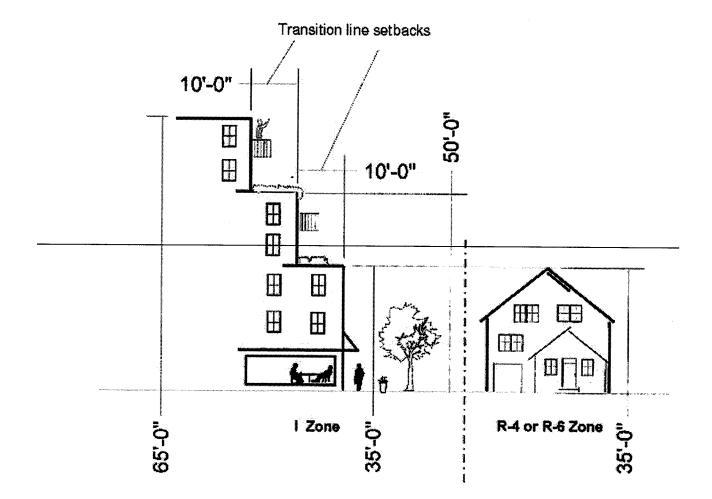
Figure Exception 20.50.020(2): For all portions of a building in the I zone abutting to R-4 and R-6 zones, the maximum height allowed at the yard setback line shall be 35 feet, 50-foot height allowed with additional upper floor setback (transition line setback) of 10 feet. Sixty-five feet allowed with additional upper floor setback (transition line setback) of 10 feet after 50-foot height limit. Unenclosed balconies on the building that are above the 35-foot transition line setback shall be permitted to encroach into the 10-foot setback.
